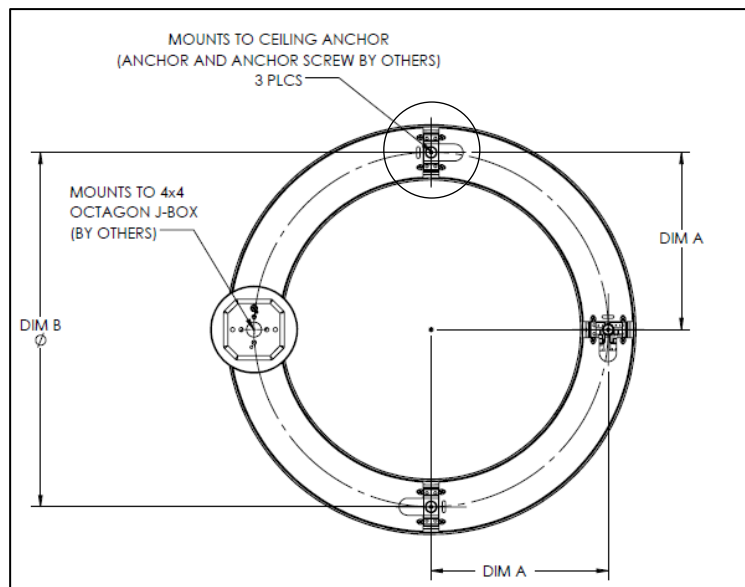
TOP VIEW SHOWING MOUNTING VIEW INFORMATION
